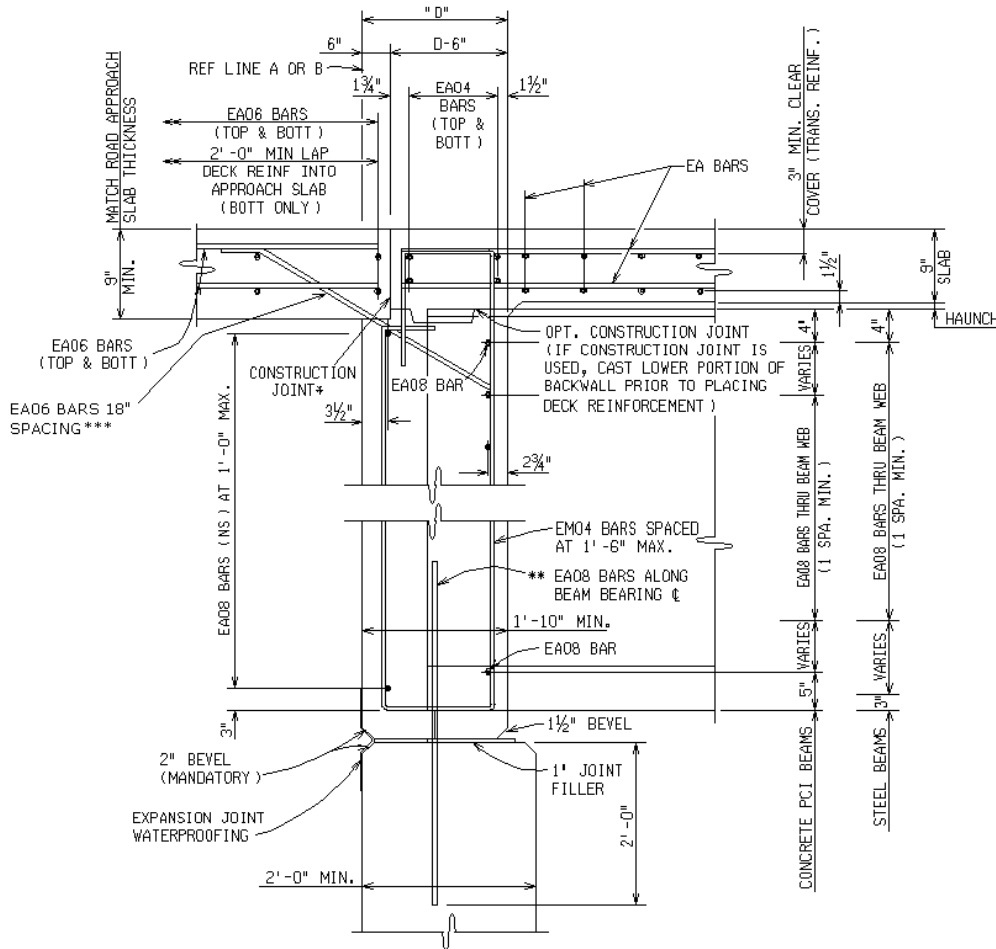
Proposed dependent backwall details for new construction; i.e., top and bottom reinforcements discontinuous through the construction joint and diagonal reinforcements are provided between approach slab and backwall
